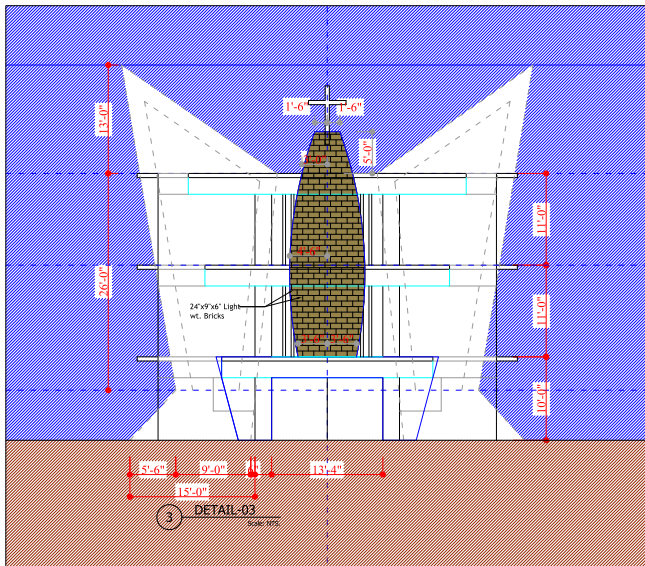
Elevation Details - Stage#1: Wings shape Construction
